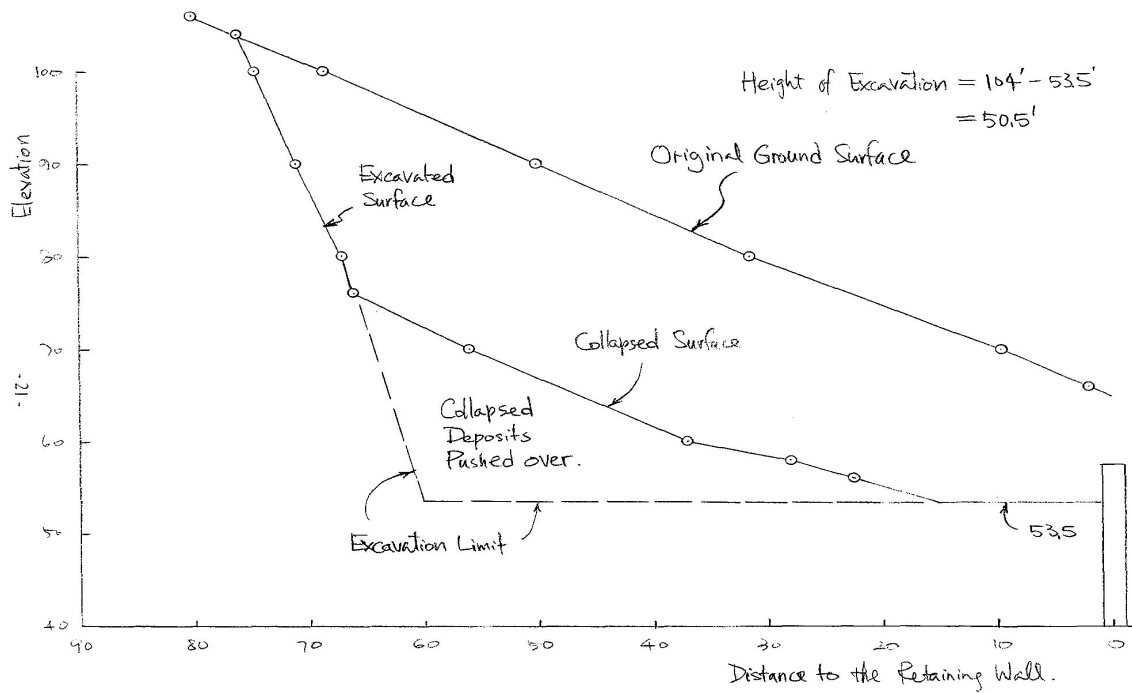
Cross Section of the Original Ground Surface, the Excavated Surface and the Failure Surface in the Collapse Area (110 feet from the turning Point of the Retaining Wall).
